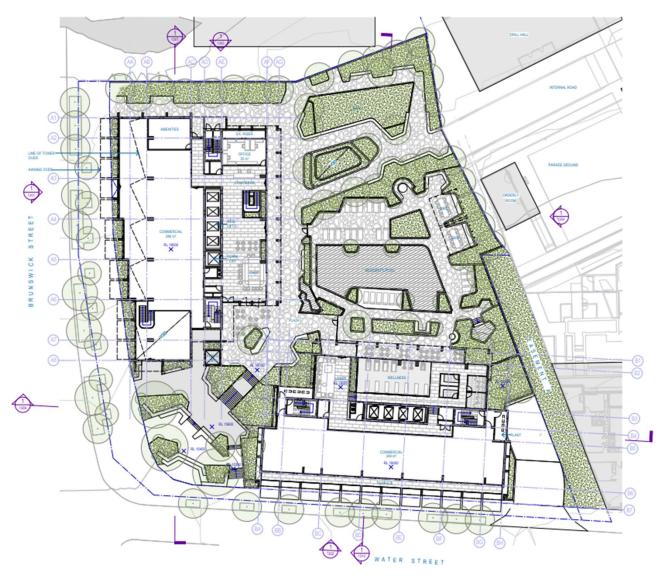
Site Layout, Plaza Level (source: Woods Bagot drawing 150536, A-1207 revision Q, dated 14 December 2023)
